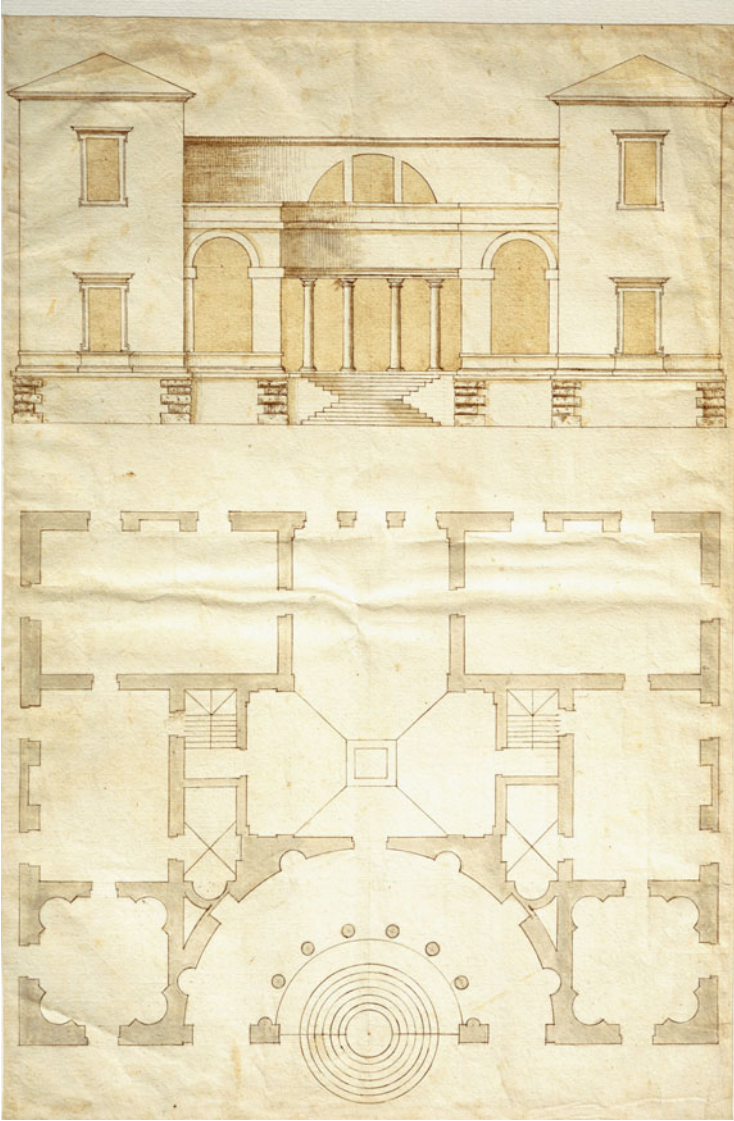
Study of a ground plan and elevation for the Villa Pisani, Bagnolo. Image: RIBA31796, by permission of the RIBA Library Drawings & Archives Collections
